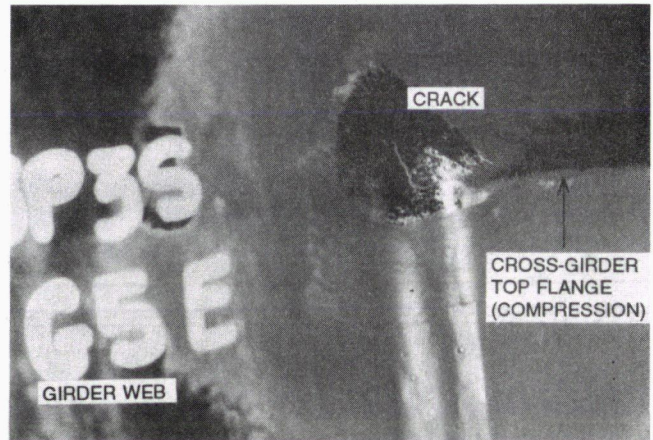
Typical crack at top flange weld intersection.
